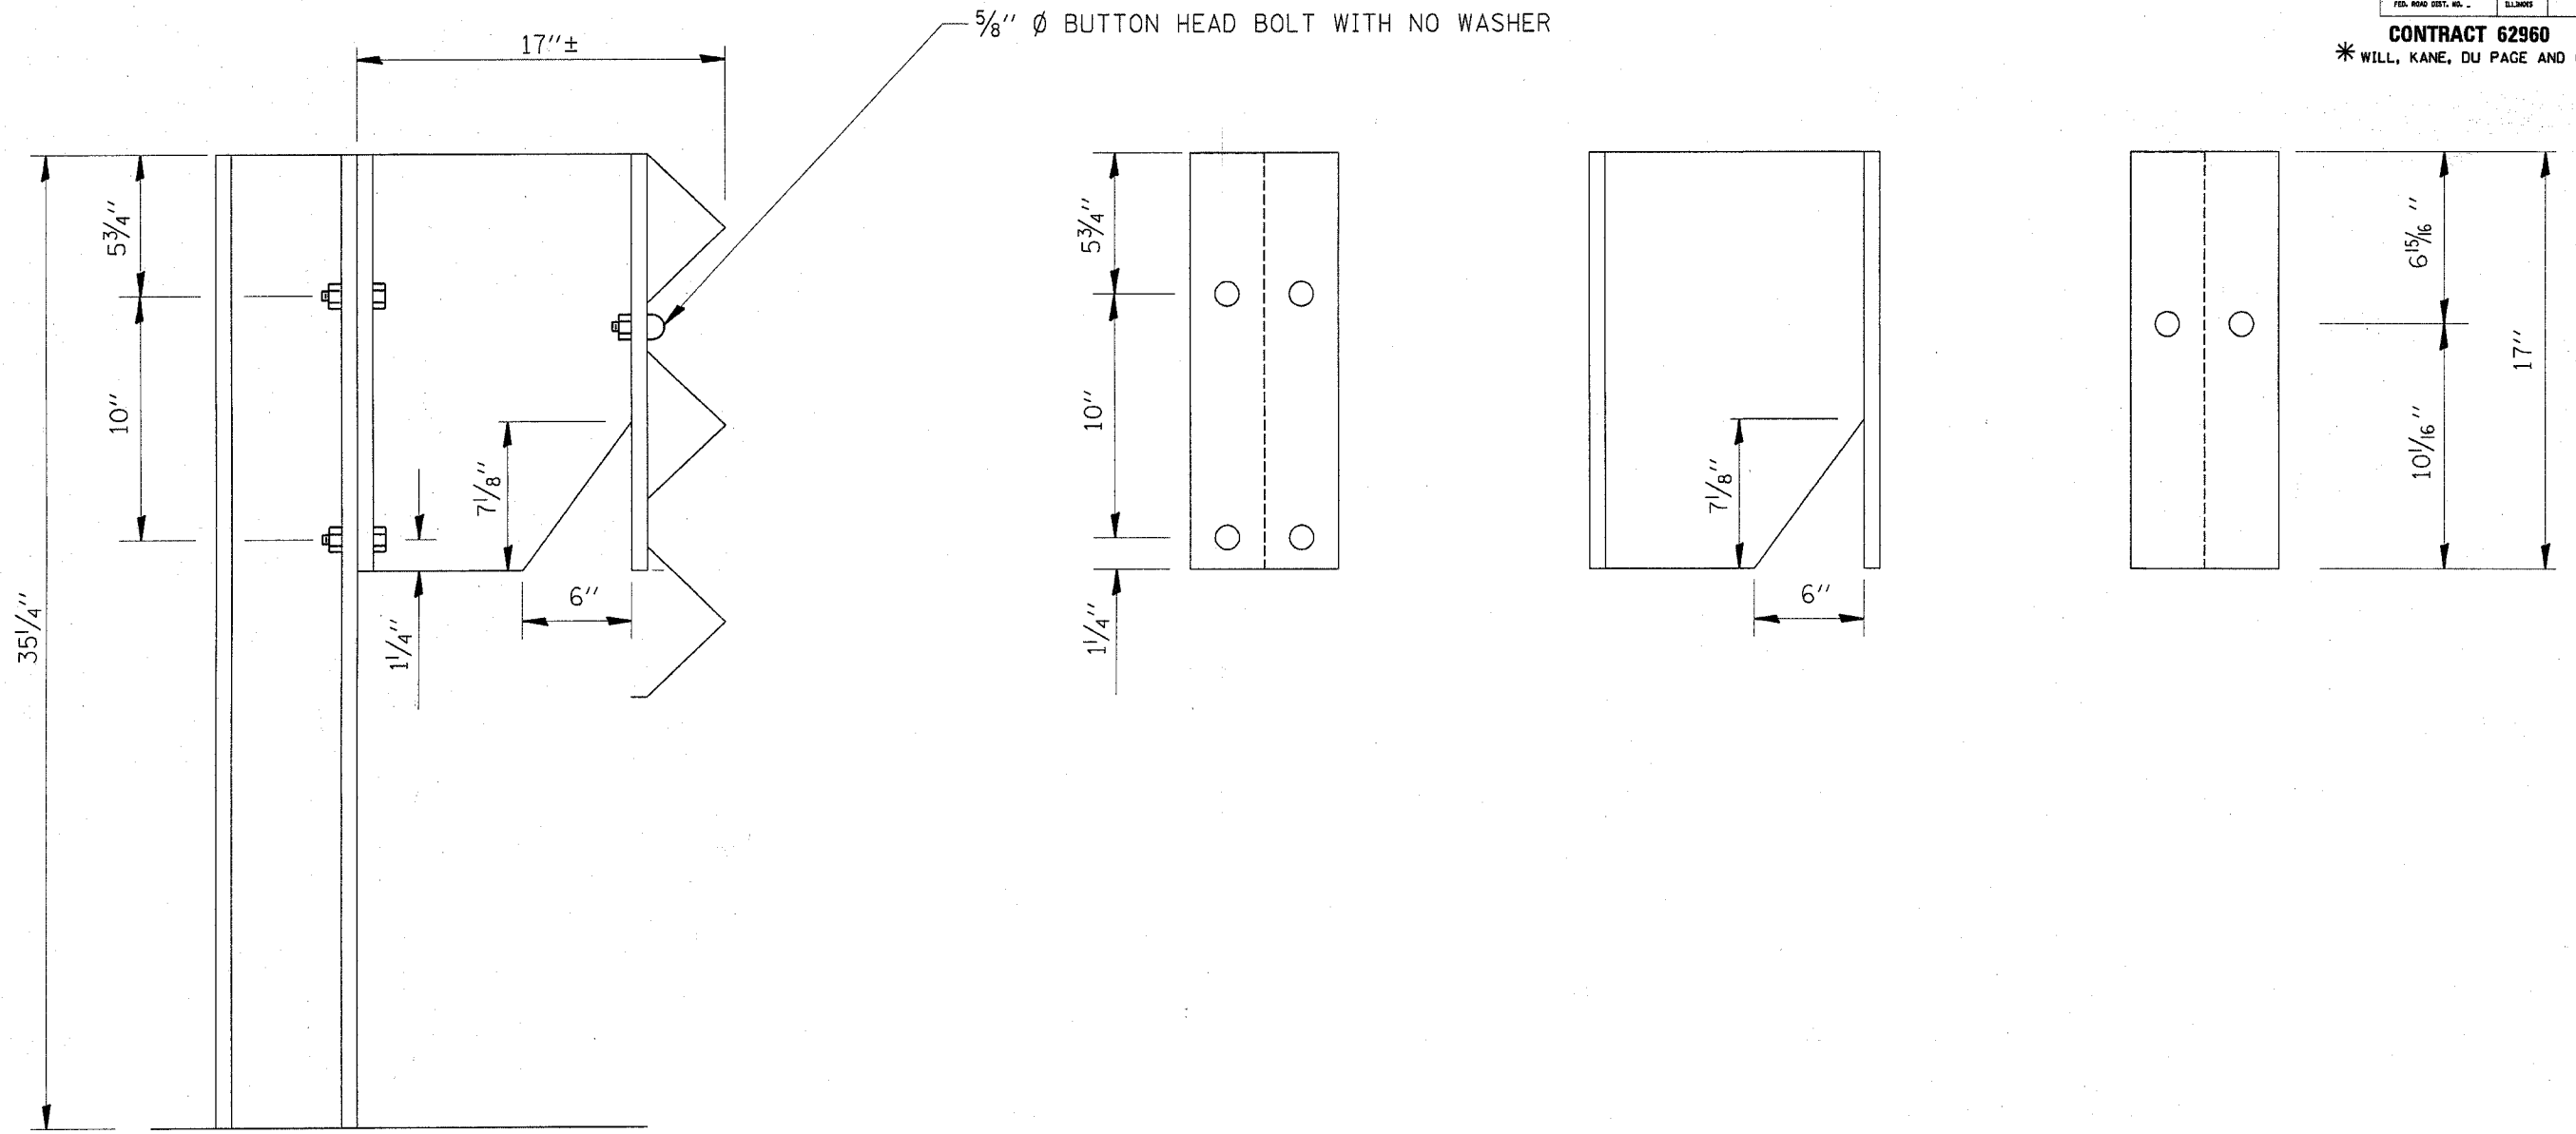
DETAIL OF GUARDRAIL SUPPORT AND END ANCHORAGE
